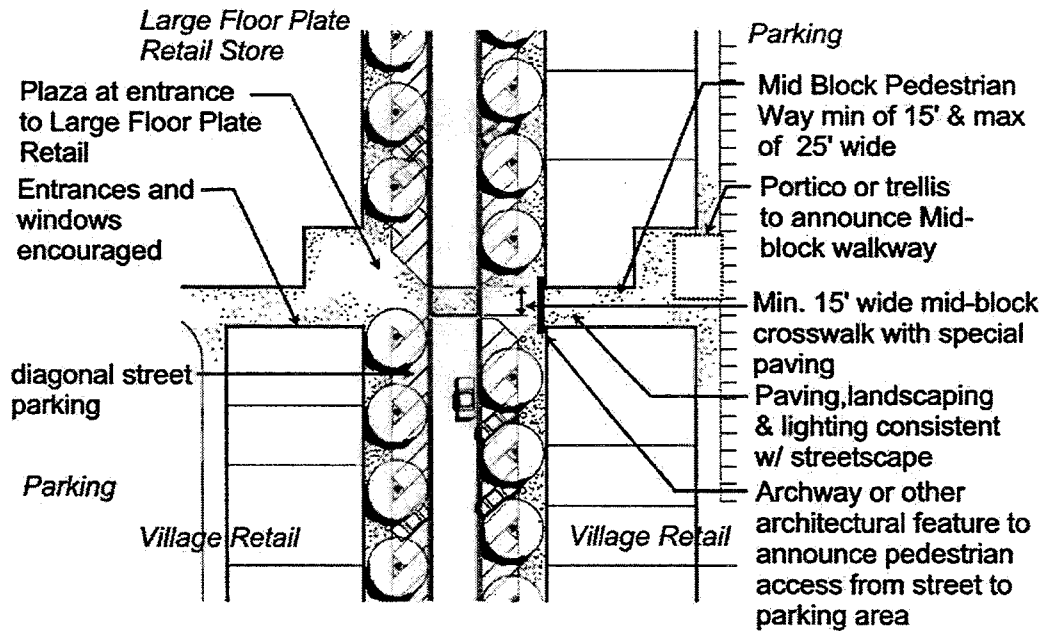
Village Center Large Floor Plate Retail-Plan View
